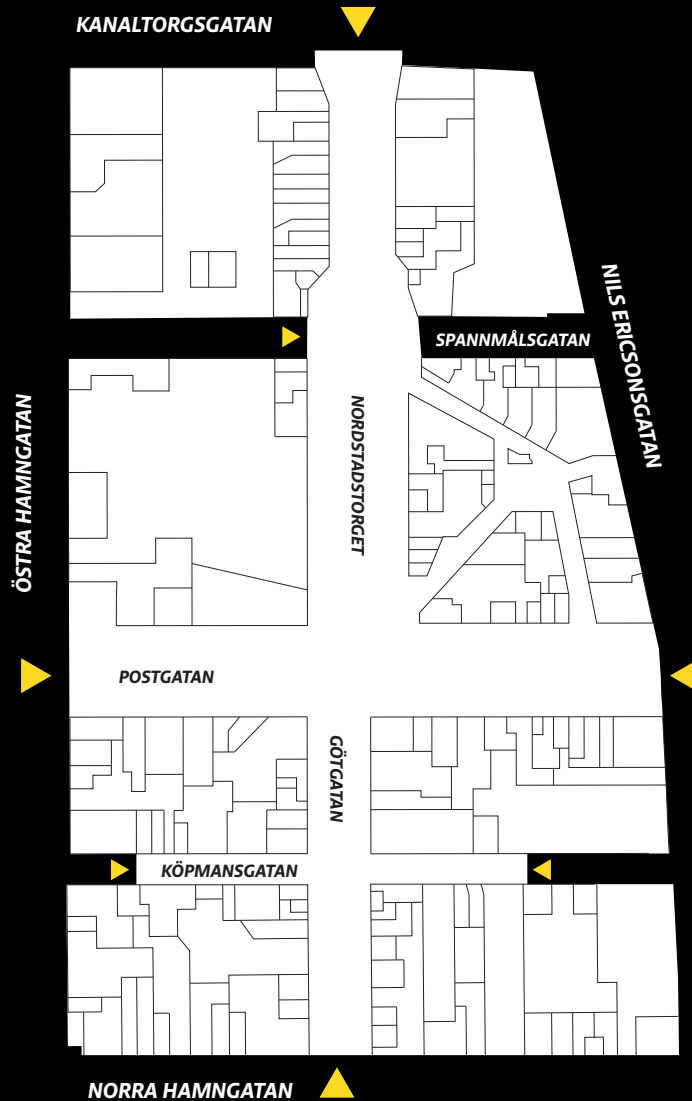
Drawing by author. Scale 1:2500. Plan of the ground floor of Nordstan.
